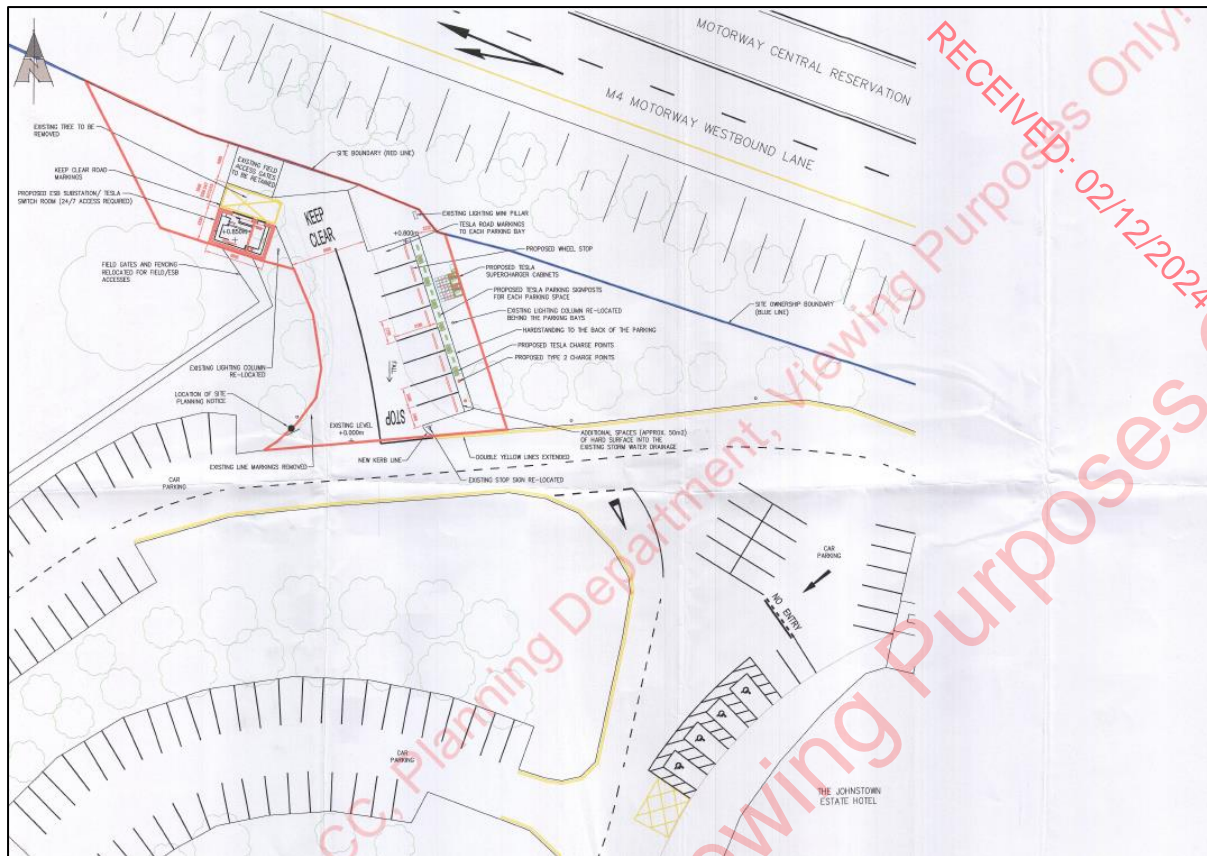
Proposed site plans and details granted under Reg. Ref. 21592.
